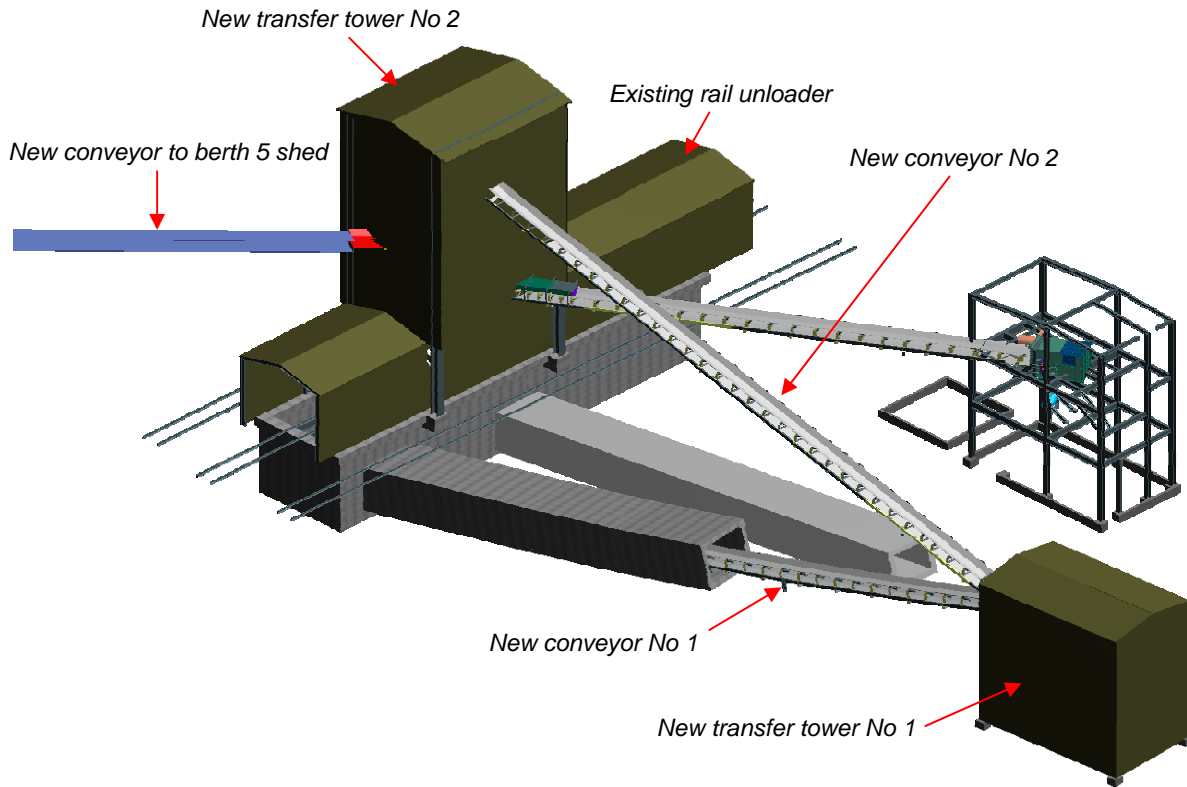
Schematic layout of new rail unloading and materials handling facilities
